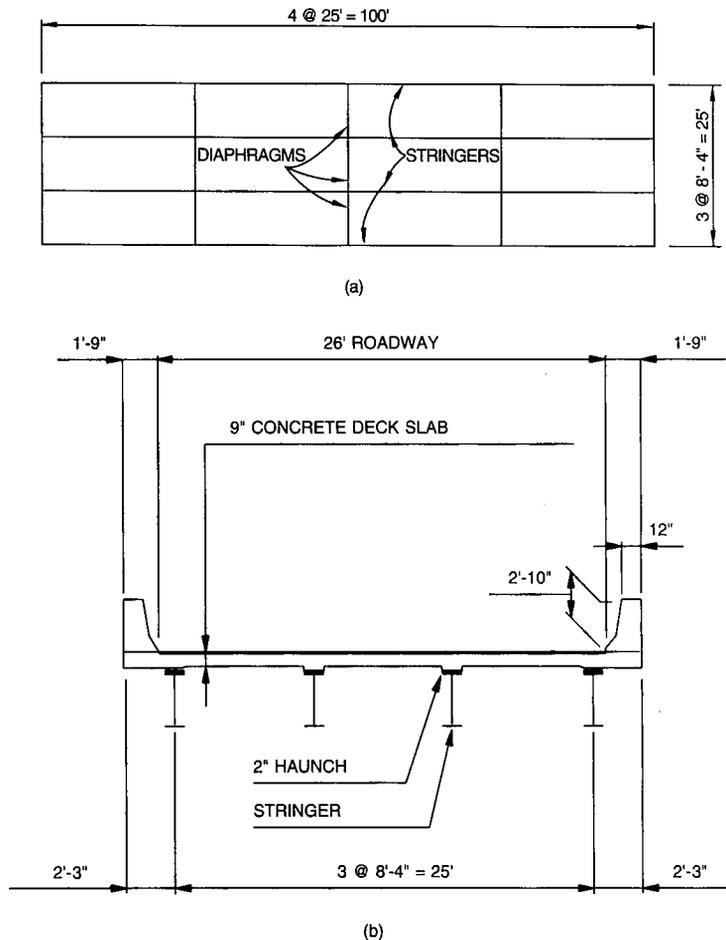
Two-lane highway bridge with plate-girder stringers. (a) Framing plan. (b) Typical cross section.
